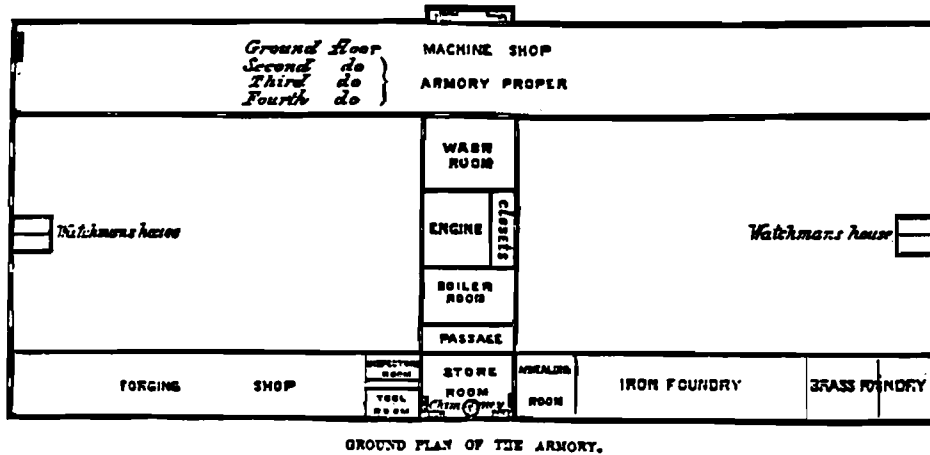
Floor plan of the Colt Armory in Hartford, Connecticut, 1855.
